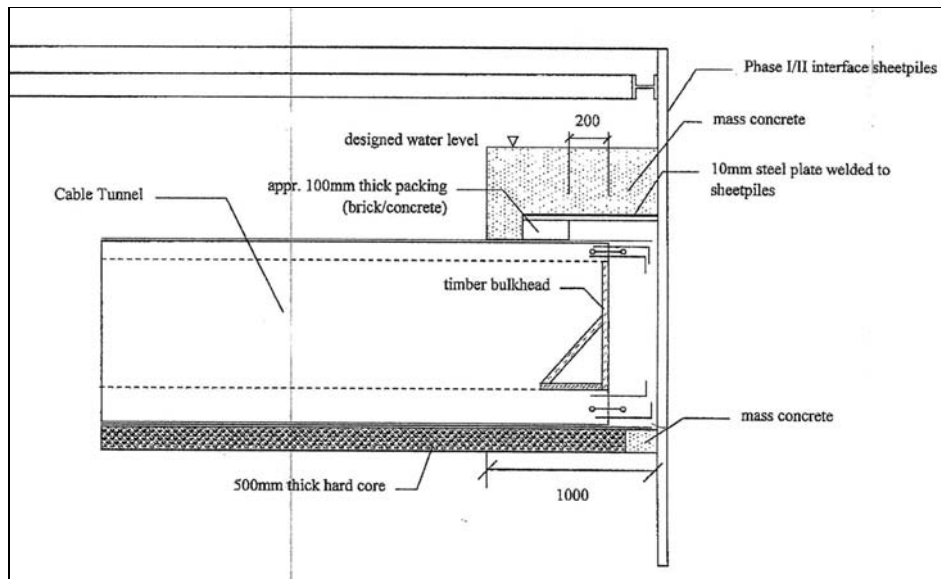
Details of temporary works at interface between phase I and phase II cable tunnel (longitudinal section)
